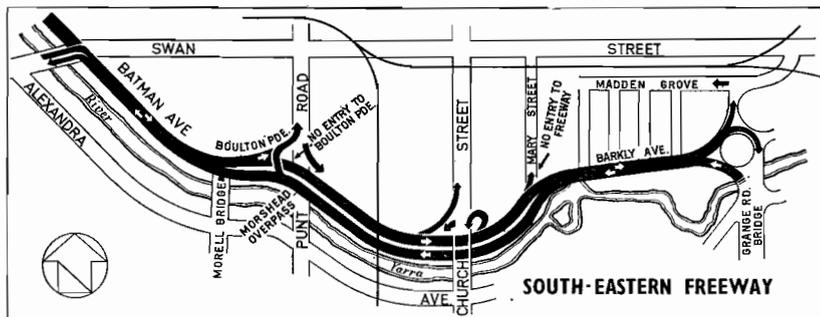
The first stage of the South-Eastern Freeway extends from Batman-avenue to Grange-road Bridge.
